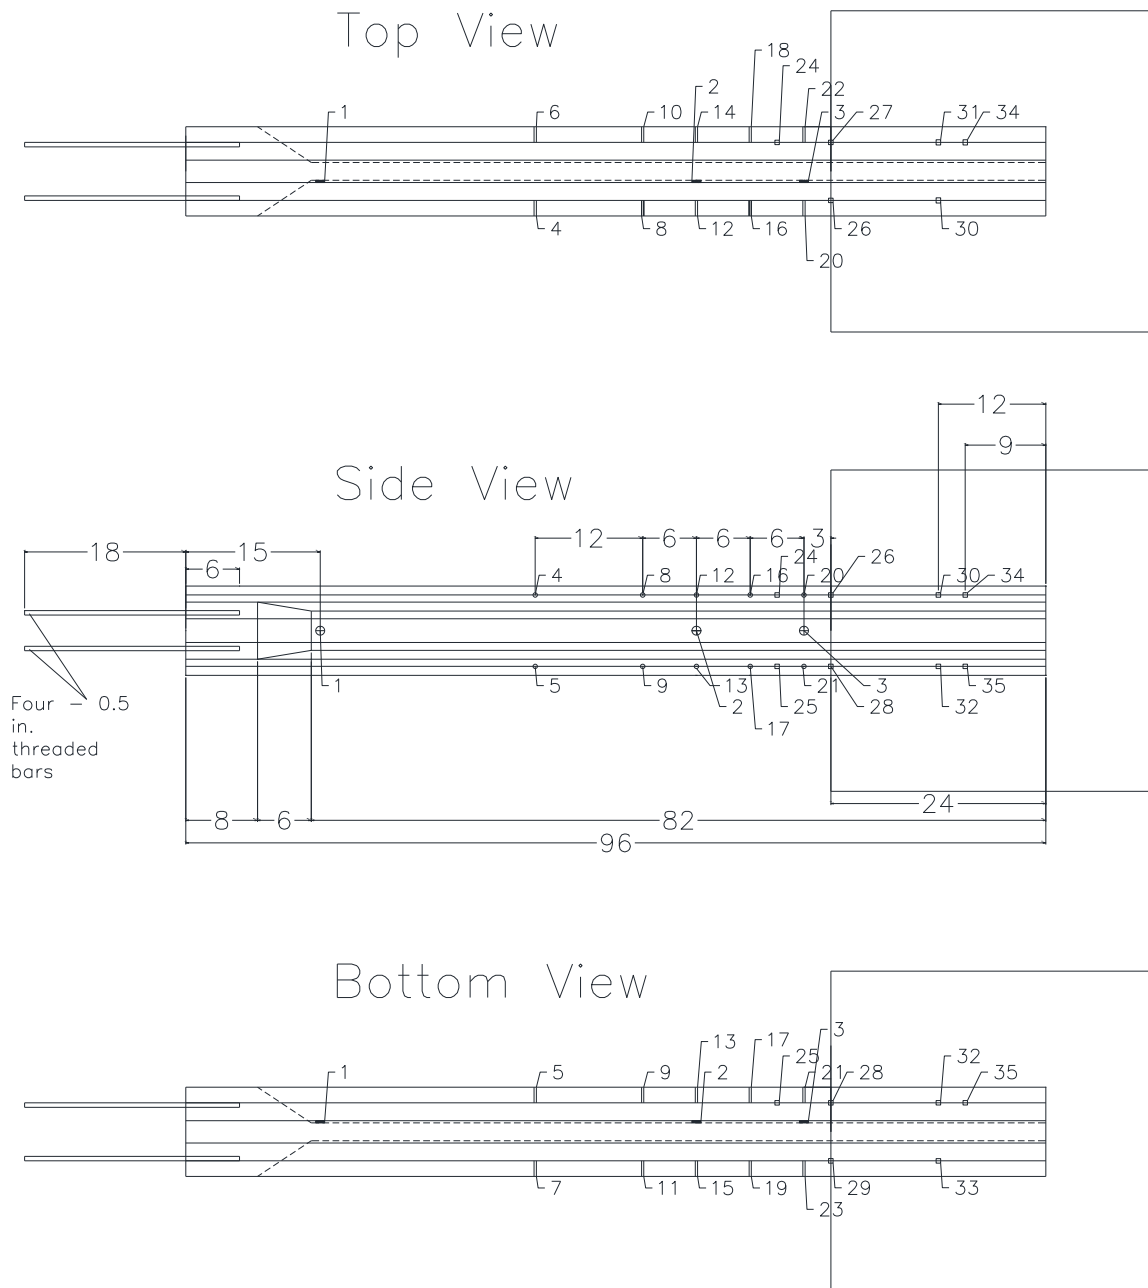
Instrumentation Plan used for UHPC Laboratory Test Units
